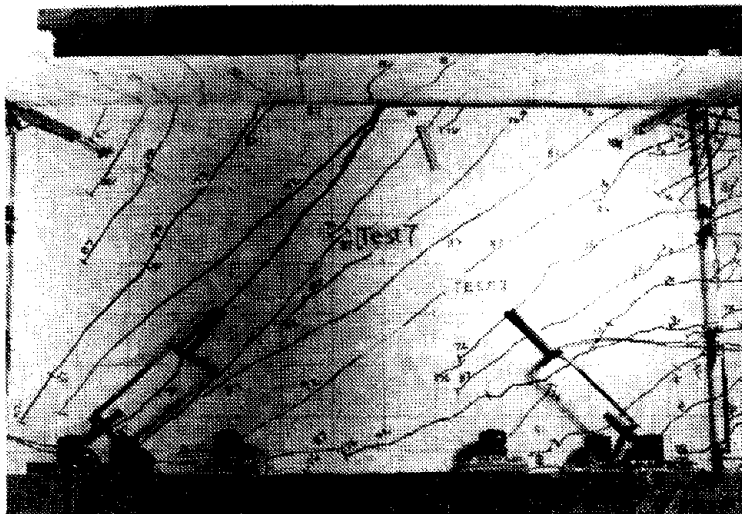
Main Crack in First Floor Panel, Specimen 6R
